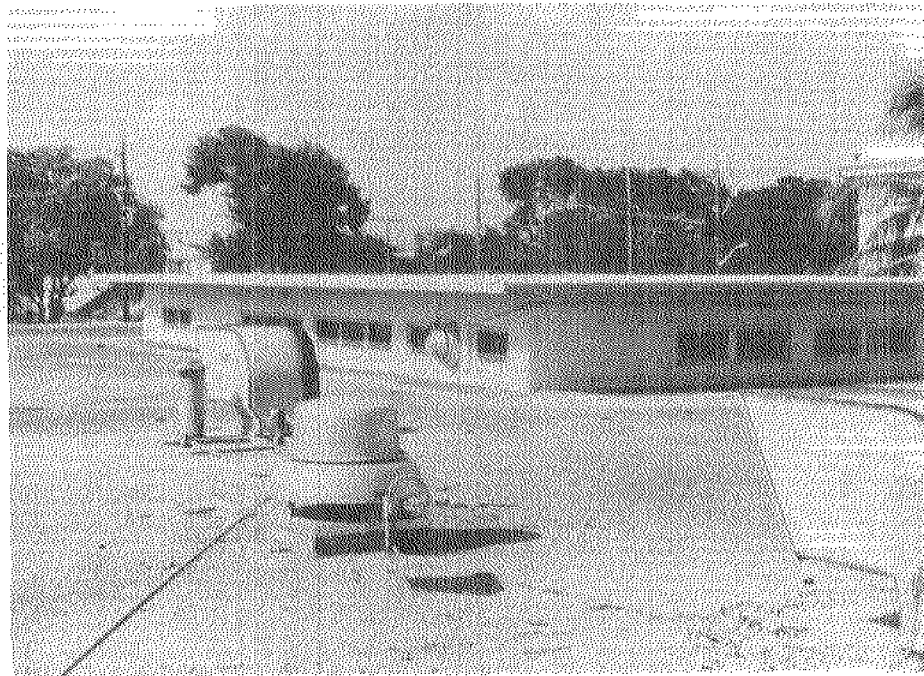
Mechanical Projections that Could Allow Rainfall to Enter Building and Could Damage Clerestory Windows if They Fail.
